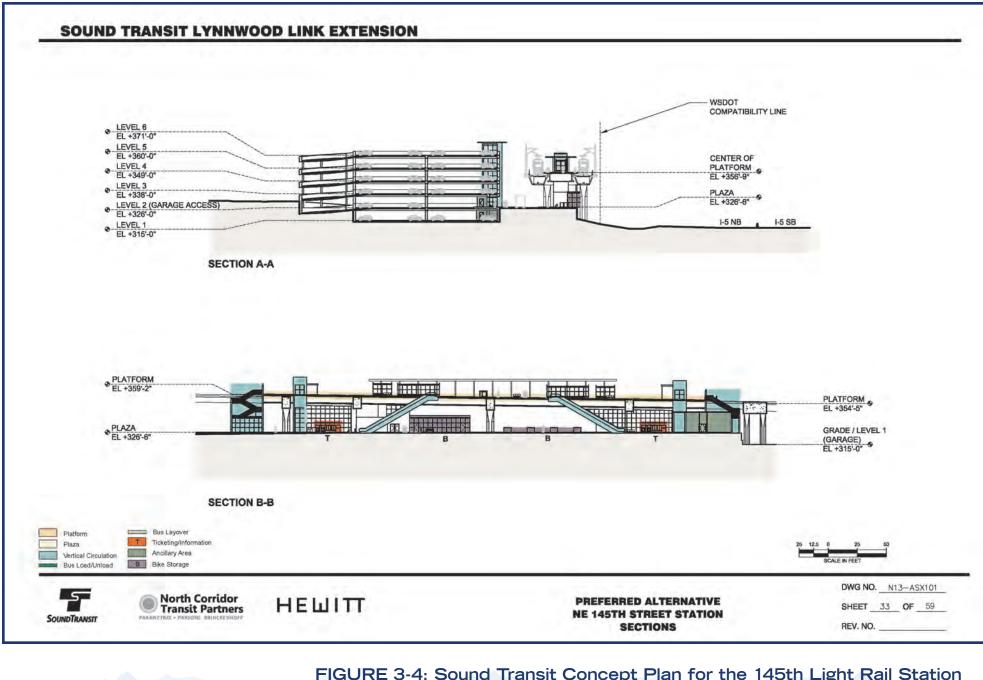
Sound Transit Concept Plan for the 145th Light Rail Station
